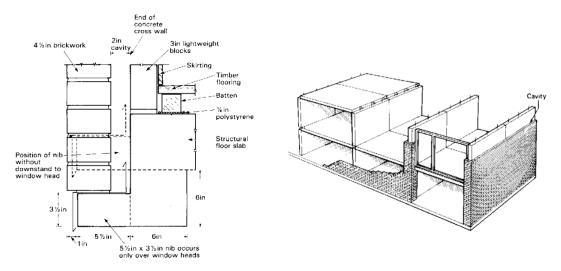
Typical brick on RC downstand Figure 7. Typical brick façade to LPS
